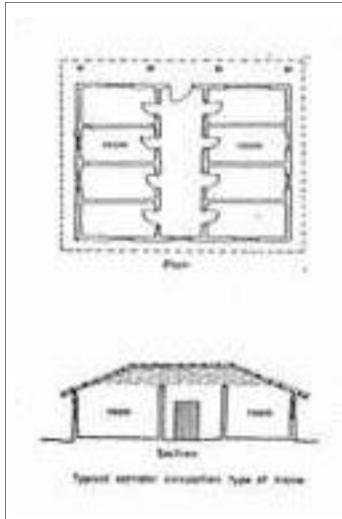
A: Old *Pumwani*, Typical Single Dwelling Block Plan and Section (Source: C. Ochieng).
